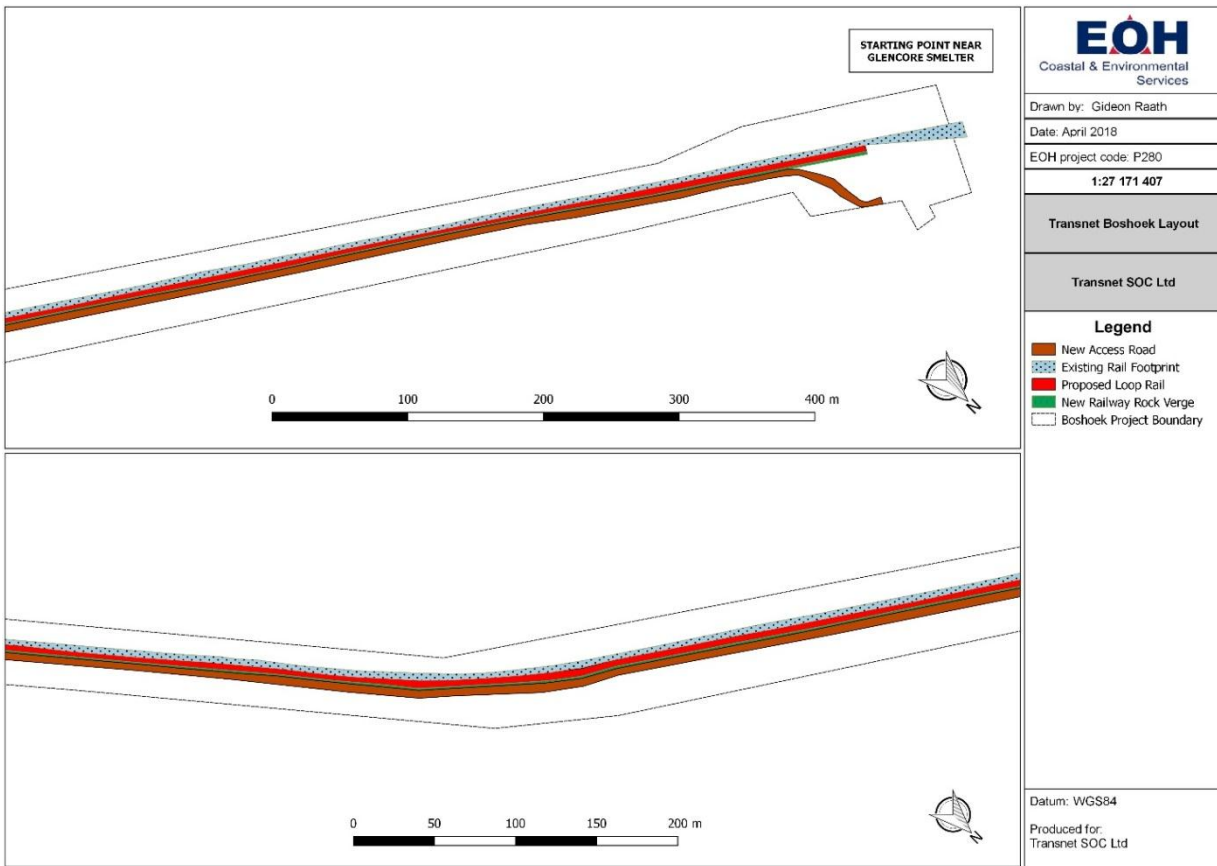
Layout map showing the existing rail footprint, the proposed new loop rail and rock verge footprint, as well as the overall project boundary.
